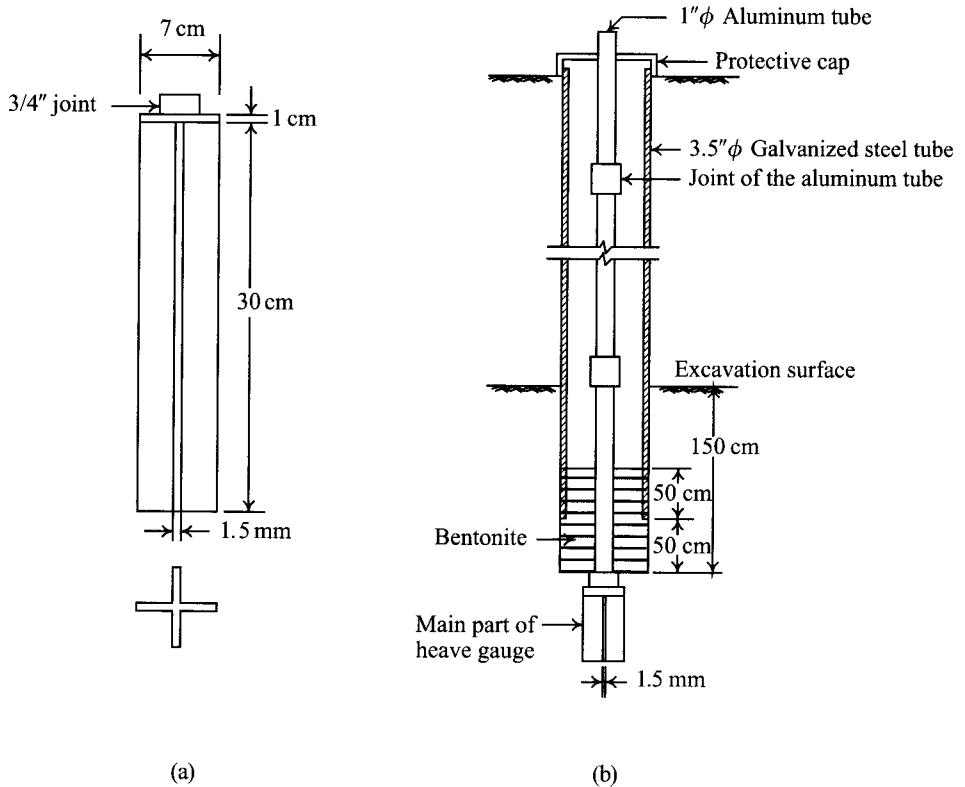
Schematic diagram of the installation of a heave gauge: (a) main part of the heave gauge and (b) heave gauge installed.
